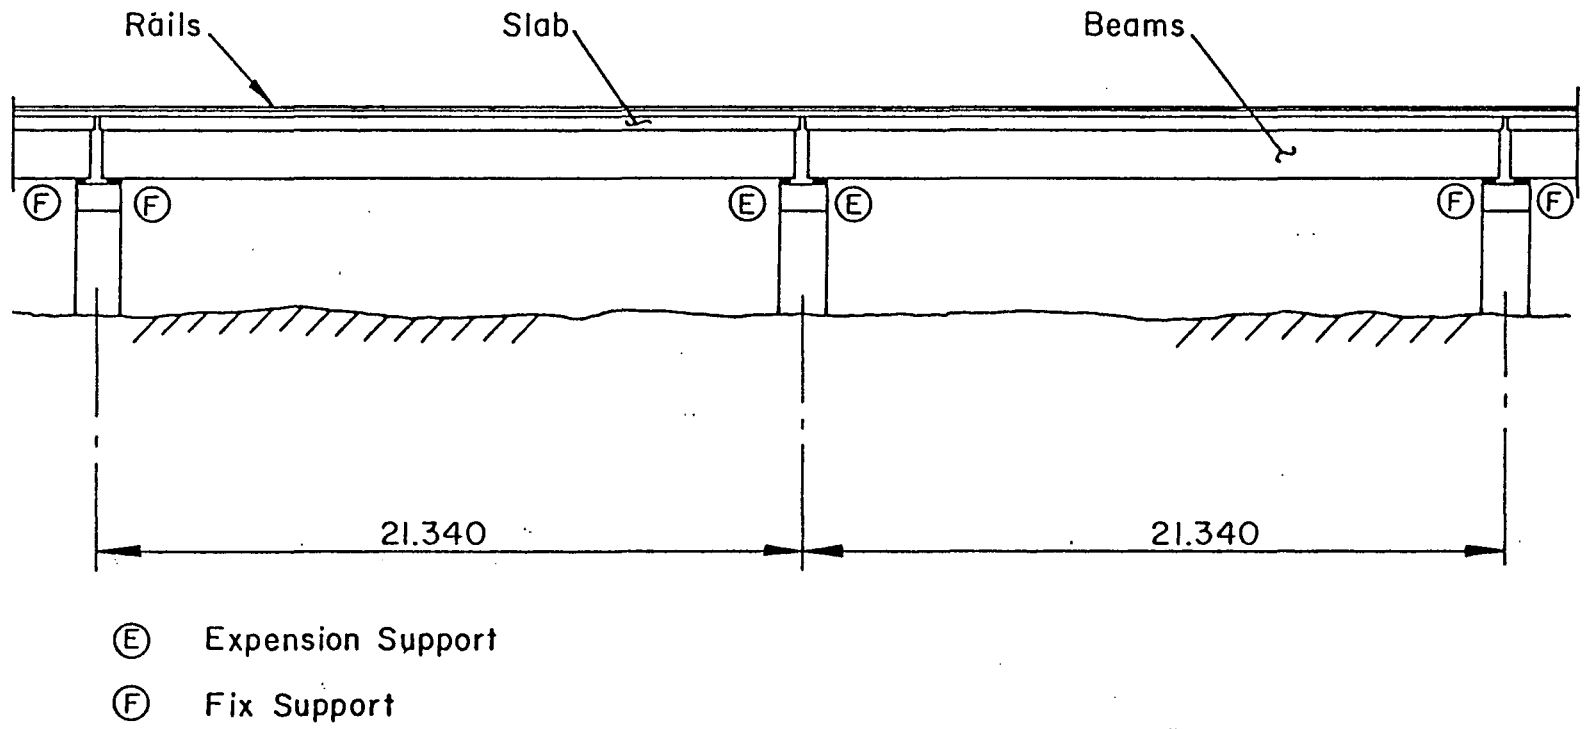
Typical Elevation of the Collingswood and Westmont Viaducts
